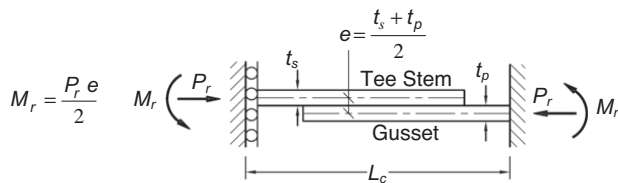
Tee stem/gusset as an eccentrically loaded column.
